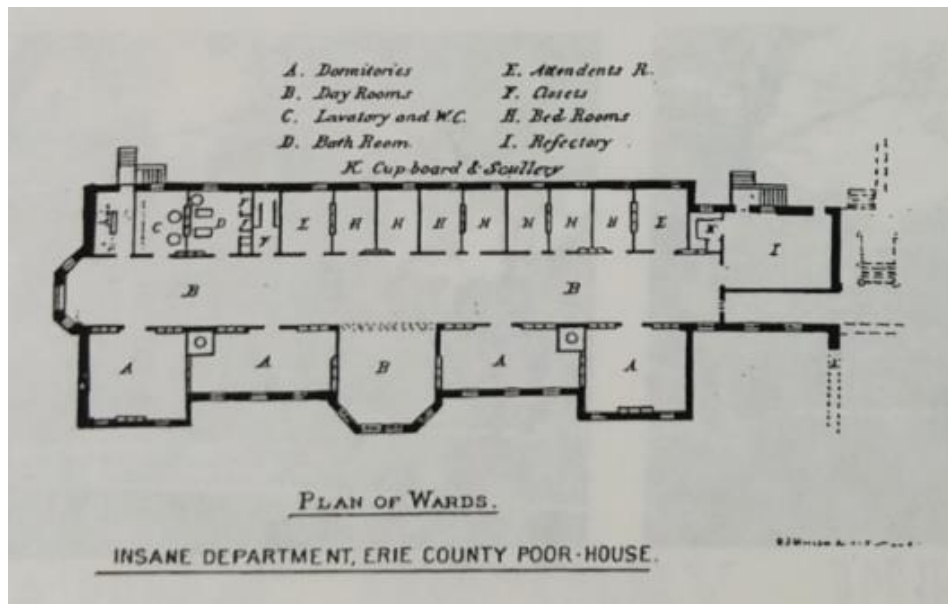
Plan of Wards, Insane Department, Erie County Poor-House, 1880. George J. Metzger, Architect.<sup>30</sup>
